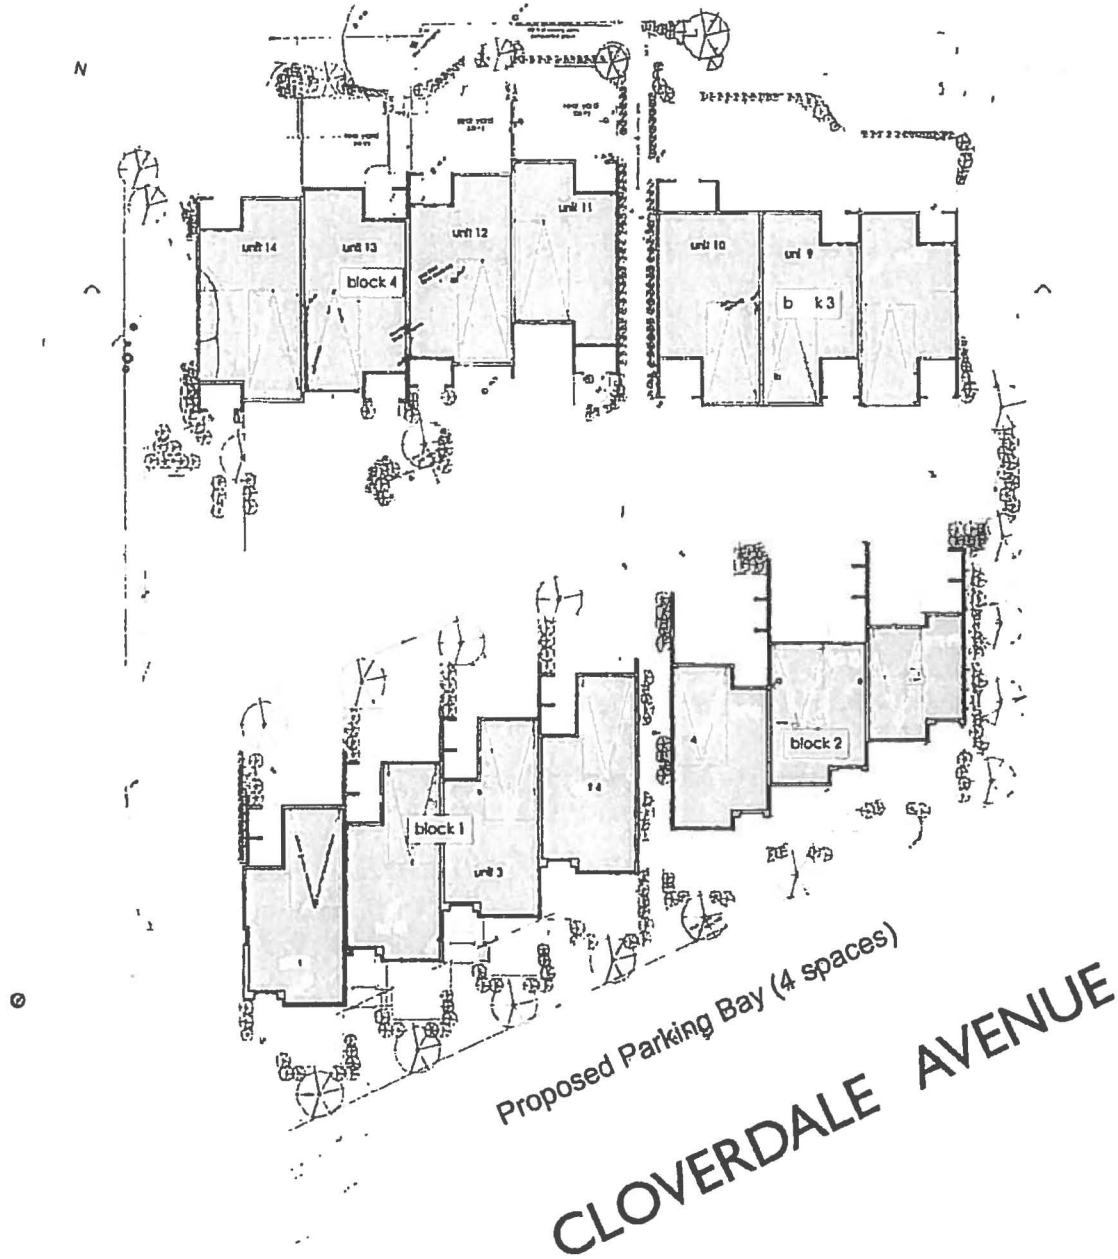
Revised Site Plan showing proposed on-street Parking Bays (from plans provided by Outline Home Design)
